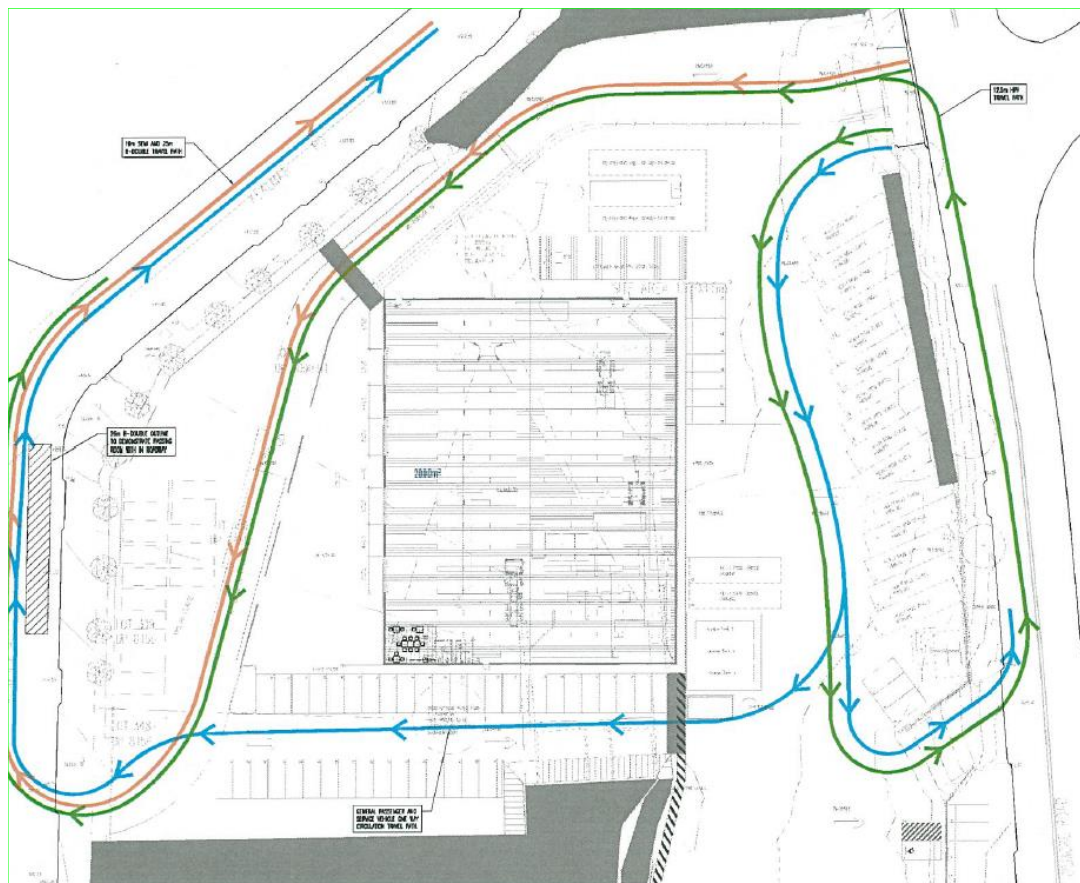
Site Plan showing the proposed traffic circulation off Gilmore Road through the site onto Bowen Place.
